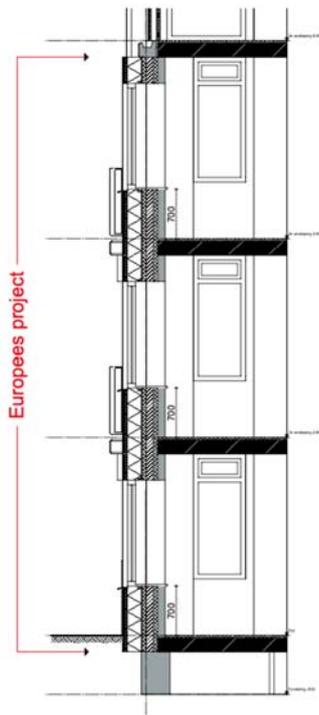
Schematic cross section of 4RinEU demo façade renovation in front of the existing cavity wall construction
